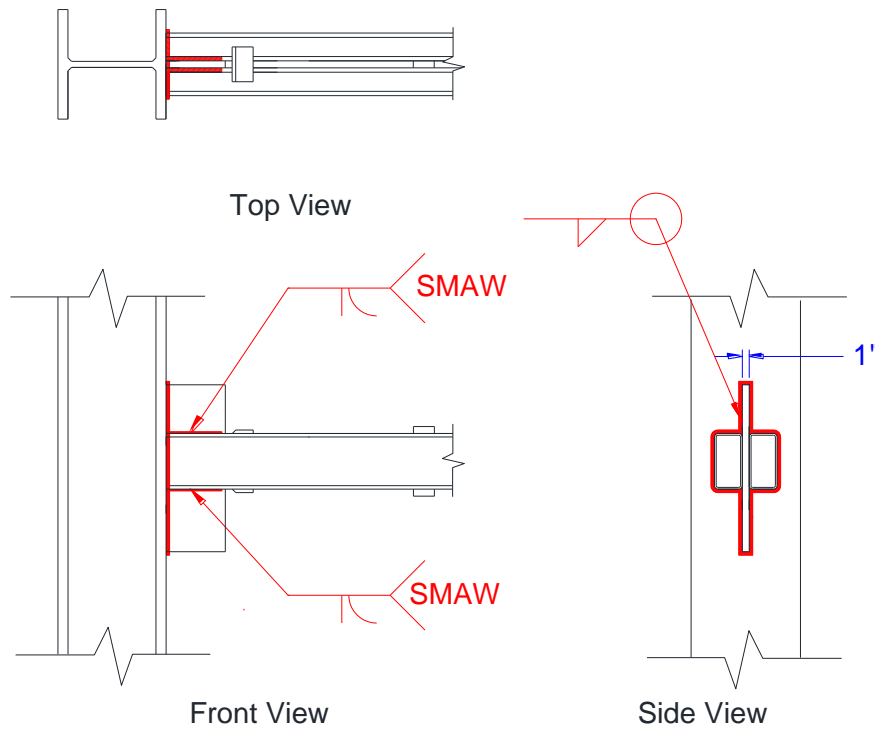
Welding Scheme at the Connection of Double HSS Component test
